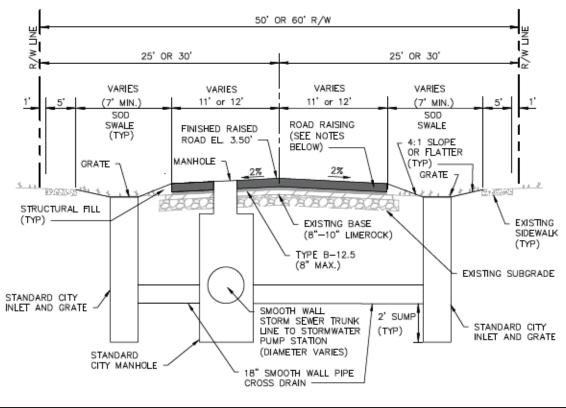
Raised Crown of Road and Added Drainage Profile
